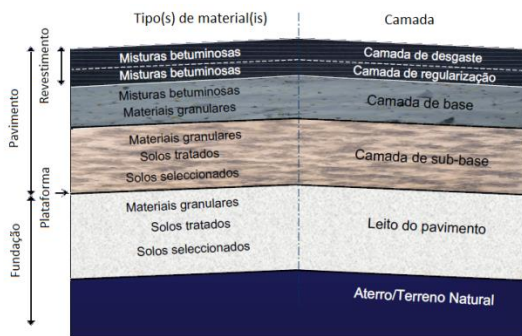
Schematic section of a flexible pavement (Antunes et al, 2006)
